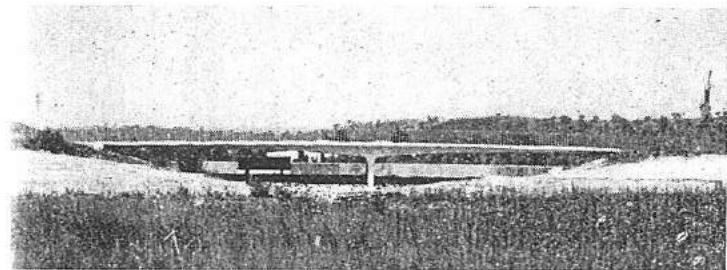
View in Elevation of Aquarium Pond Footbridge.
